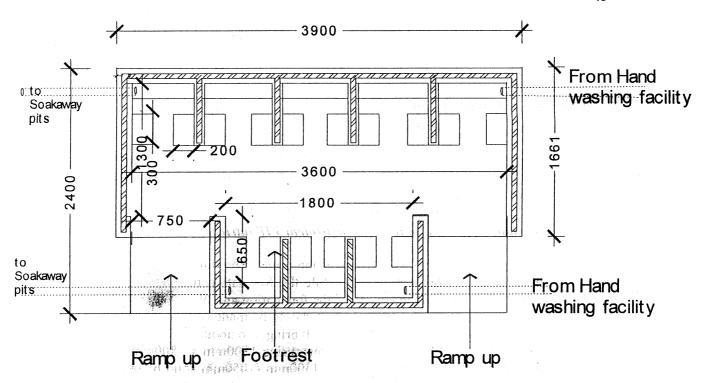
The Floor Plan of the 8-Users Stand Alone Urinal
